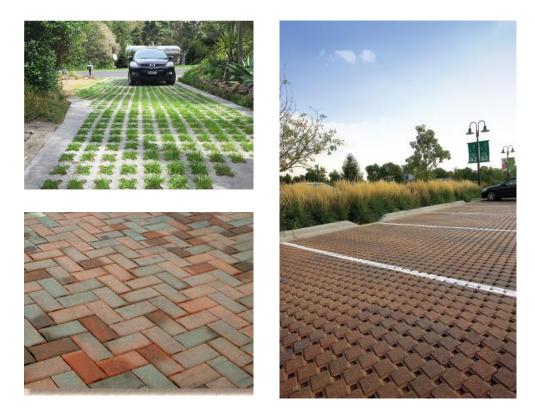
Examples of pervious pavements to replace typical hardstand areas
